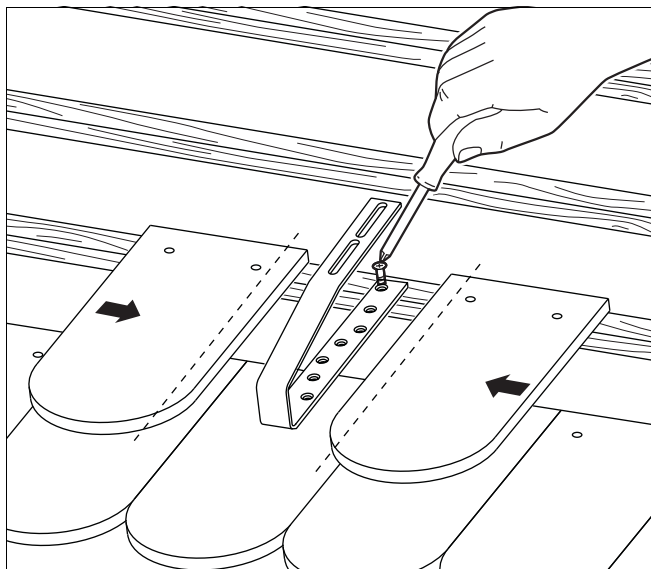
Cut crown tile and install special additional roof hooks (accessories)
